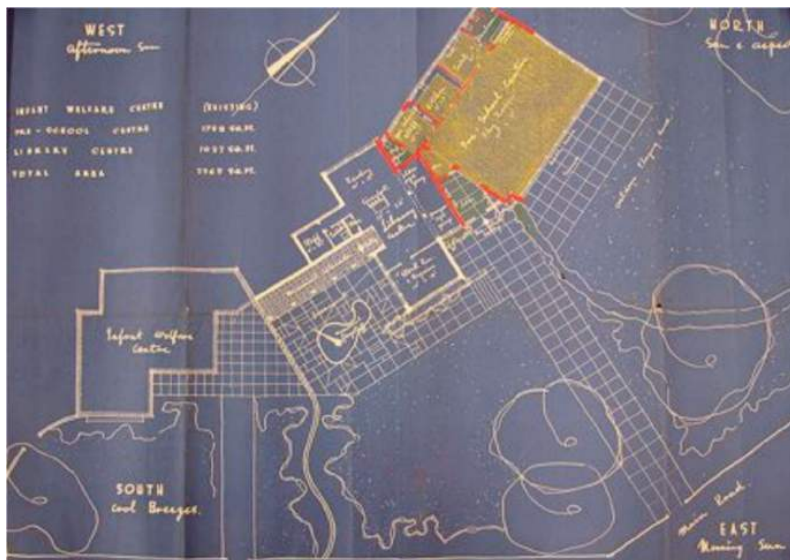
Sketch site plan c.1953, showing the spatial relationship of the Infant Welfare Centre, Children's Library and Pre-school. (Source: Public Building Plans File No.5841 Plan No.4057, Unit 413, VRPS 8044, PROV, cited in Mills and Westbrooke 2010:12)
